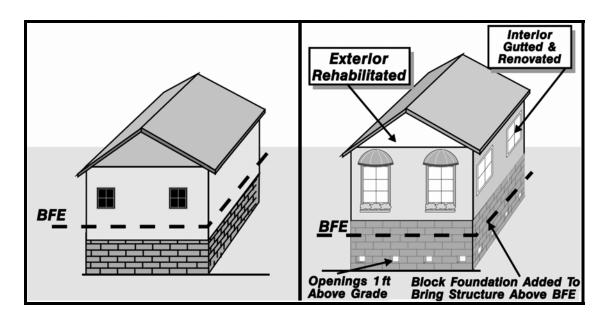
Substantially rehabilitated building elevated above the base flood elevation. The new structure would benefit from post-FIRM flood elevation rates.
